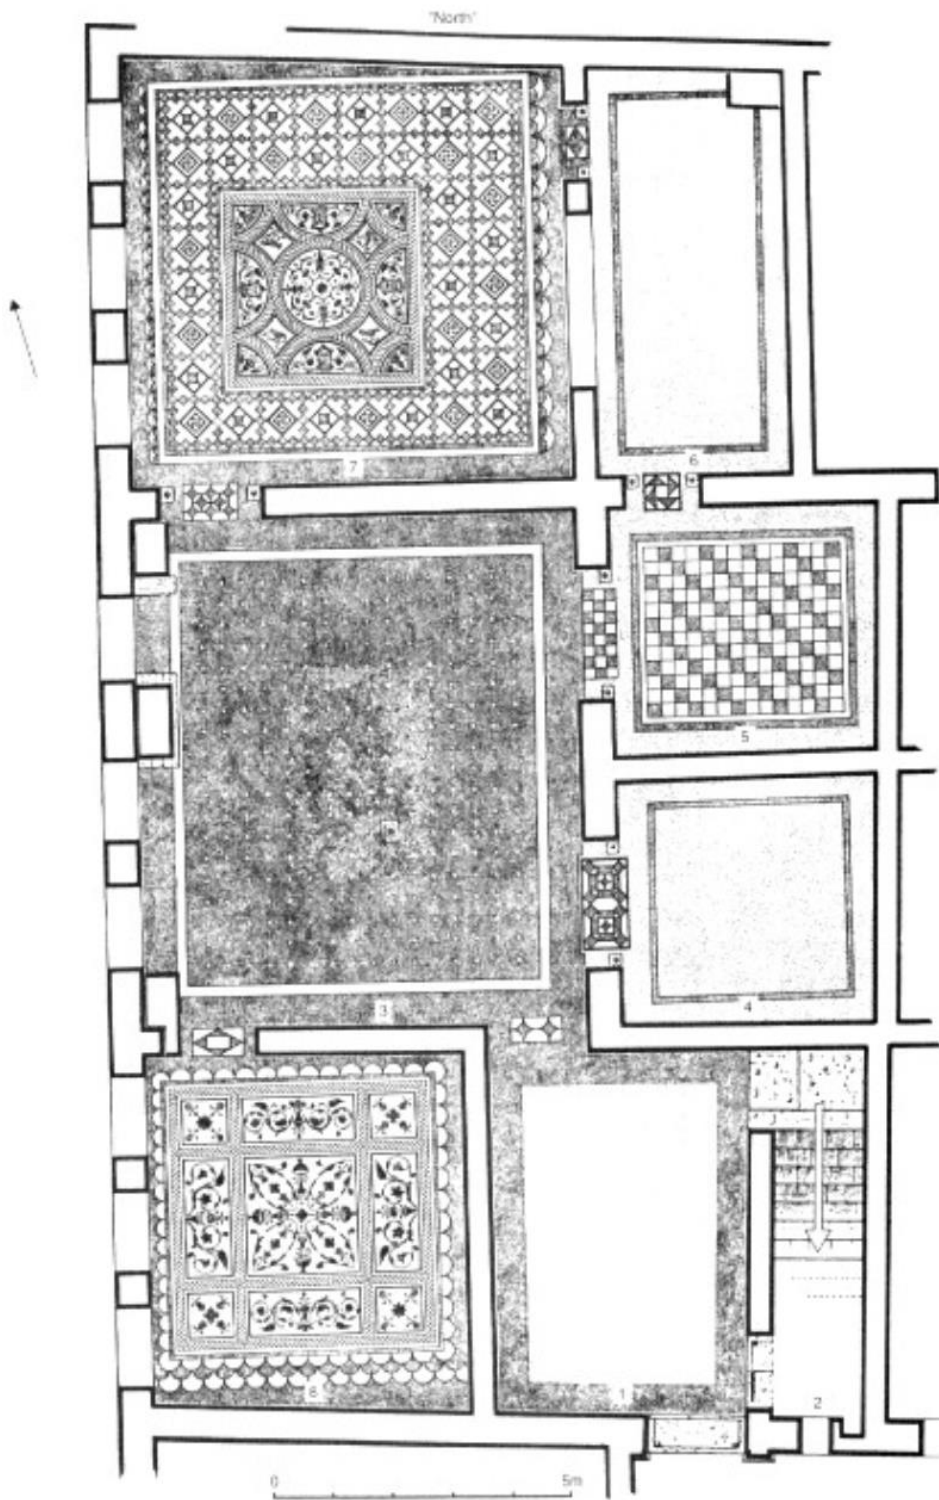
Floorplan of the House of Yellow Walls. Note that the larger reception rooms (L) have windows, while the small private rooms (R) cannot have windows because they share a wall with the House of the Graffito.
